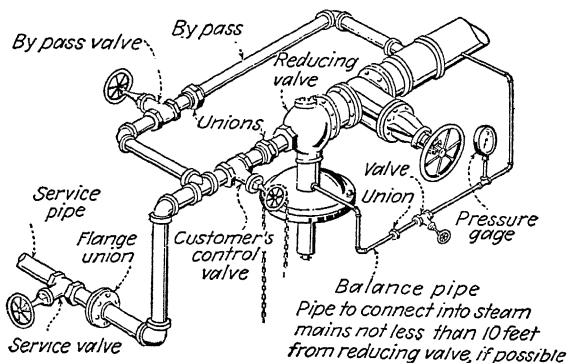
Connections for reducing valves of size 4 in. and larger, and for expanded valves.
